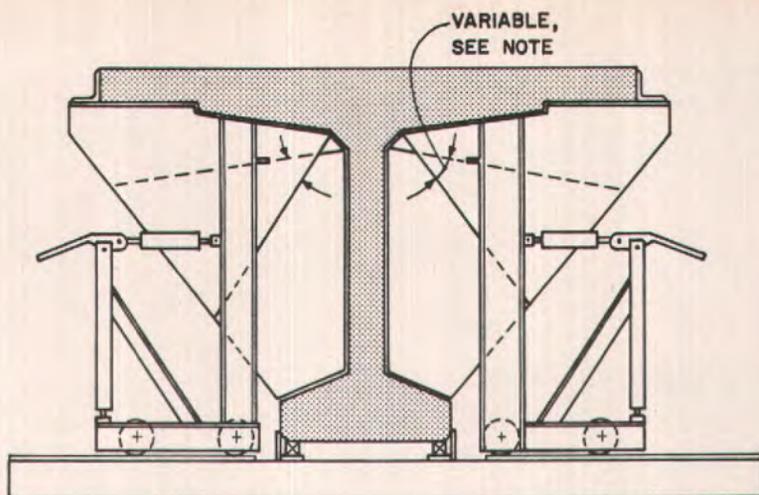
Form used to construct I-shaped girder segments. (Note: Plane of deck may be varied with respect to web of I-beam).
